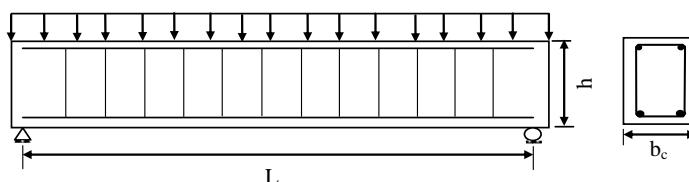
Geometry, arrangement of reinforcement and load of the beams.
